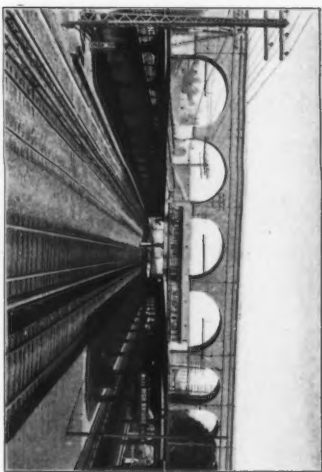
TYPICAL GRADE CROSSING ELIMINATION, WITH OVER-HEAD STATION AND TRACKS BENEATH (HIGH BRIDGE).
